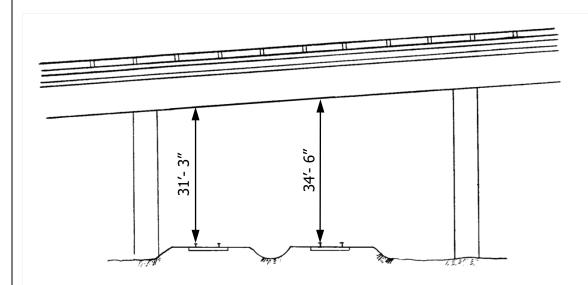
Bridge elevation view with two freight/passenger rail tracks below the bridge.
